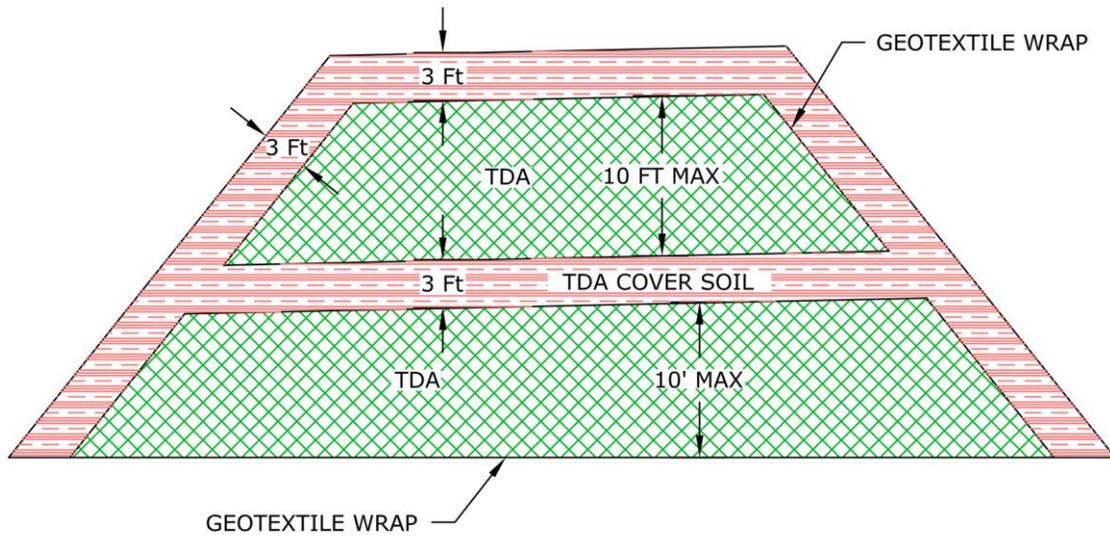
Cross Section of Dixon Landing Embankment Project Using TDA
